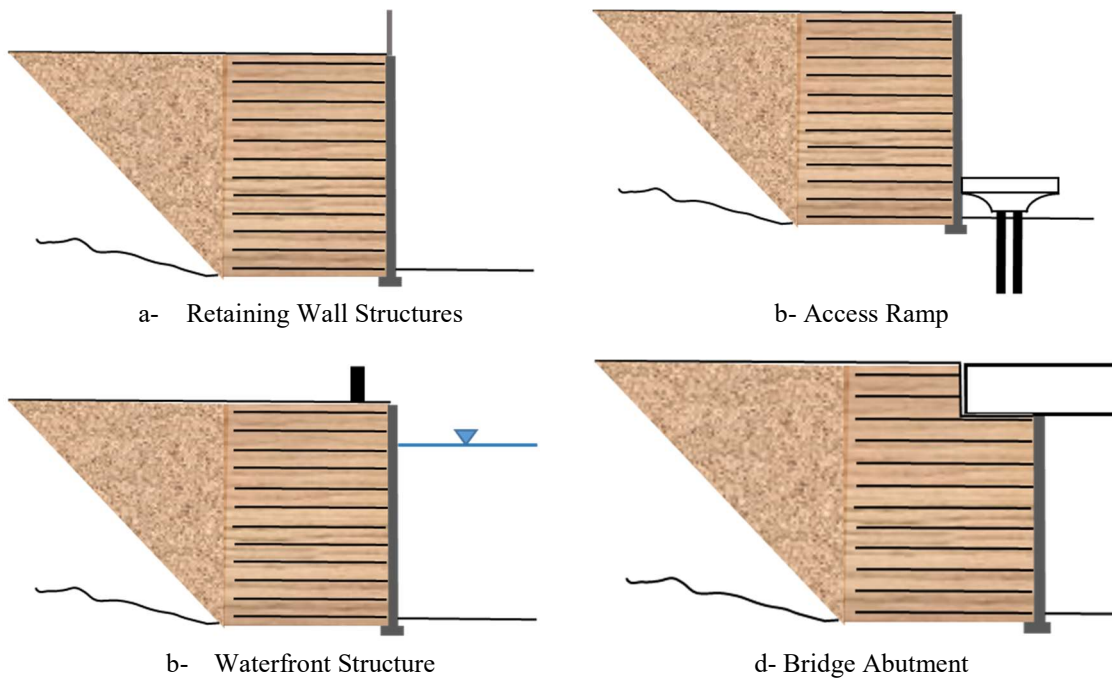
MSE wall applications (Modified from Berg et al.(2009))
